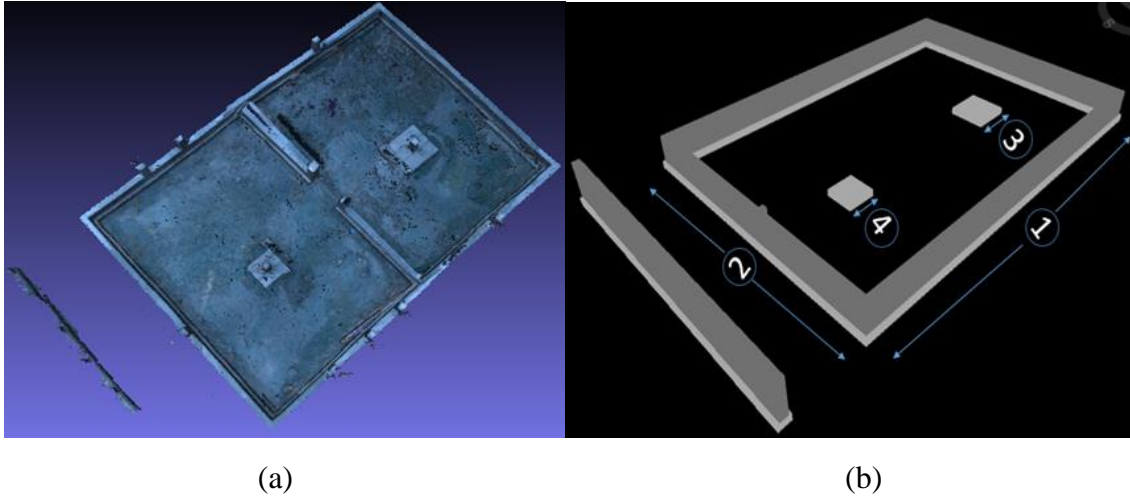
(a) As-built model generated using mobile laser scanner in exterior conditions; (b) 3D BIM model highlighting the components selected for dimensional accuracy testing.
